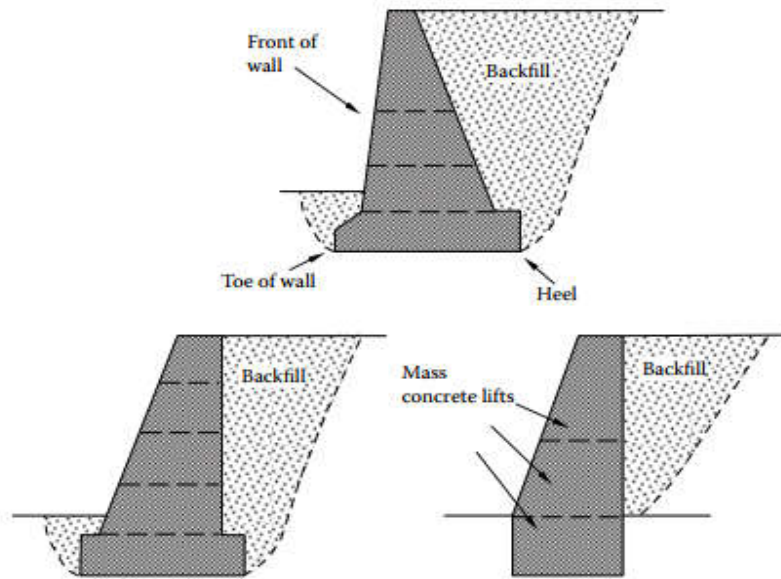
Cross section of a gravity wall (Clayton, Woods, Bond, & Militisky, 2013)
